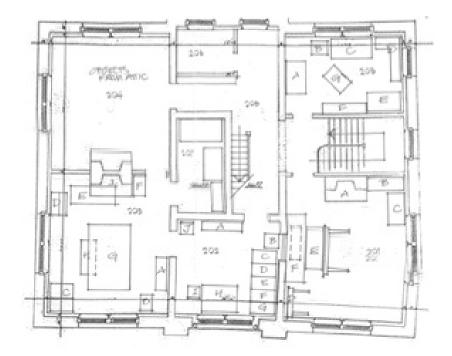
Floor plan with large object location and label for inventory. From KNHP Accession KEWE.00033.
